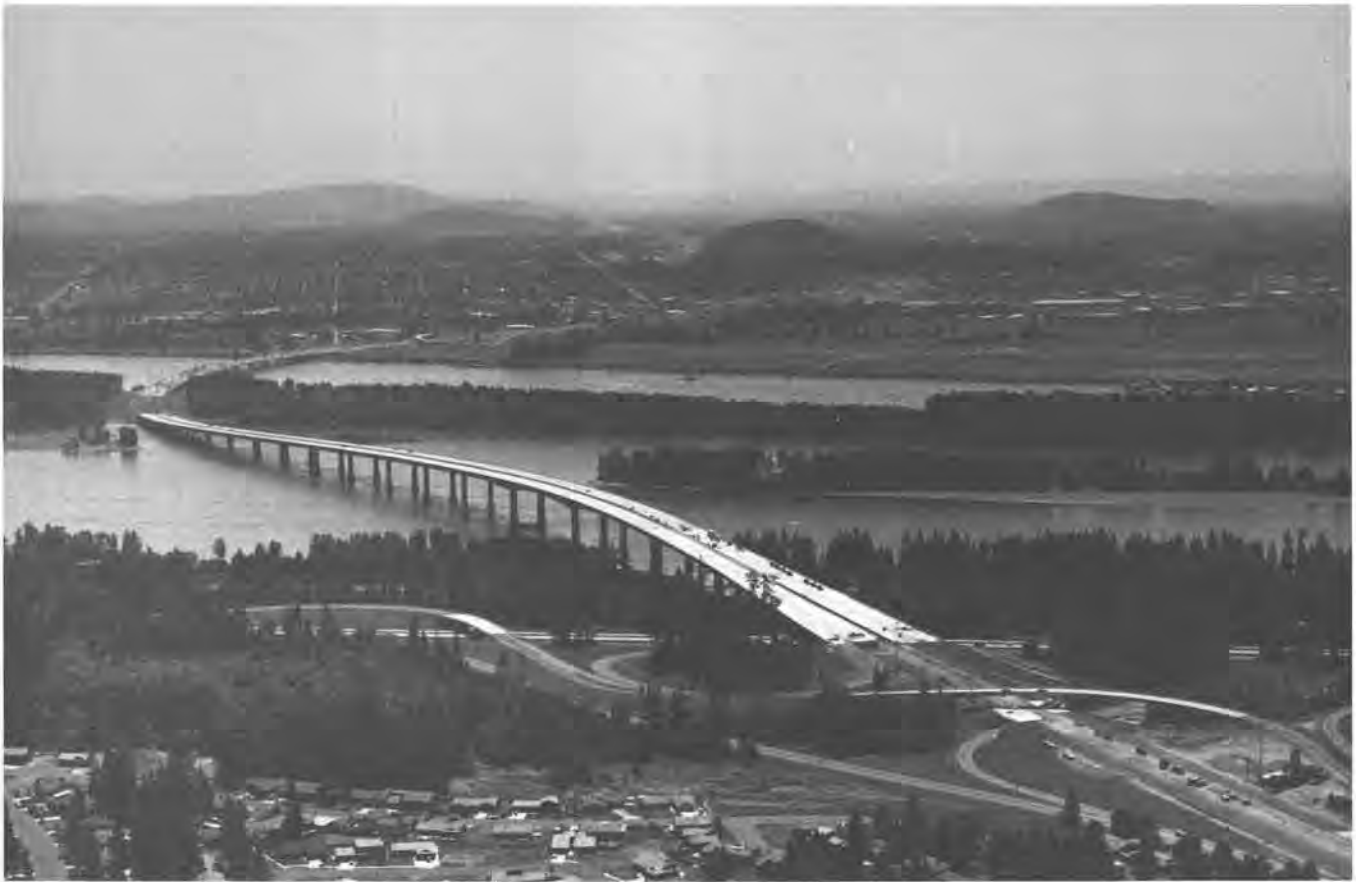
The Glenn Jackson Bridge as seen from the Washington (north) side of the Columbia River. The bridge crosses the North Channel to an embankment on Government Island and then crosses the South Channel into Oregon.
